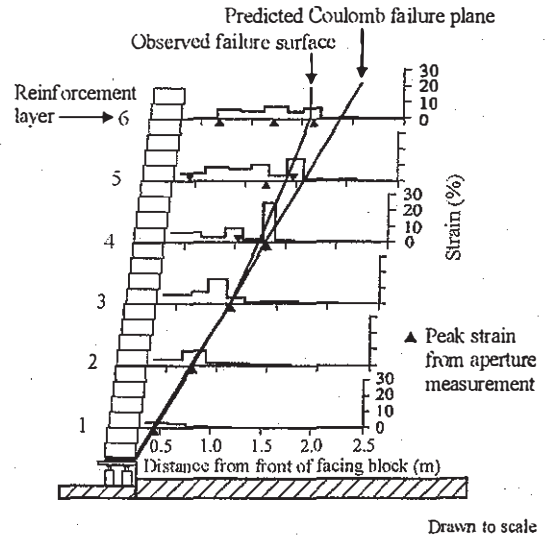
Location of peak reinforcement strain and internal failure surface for Wall 2.
